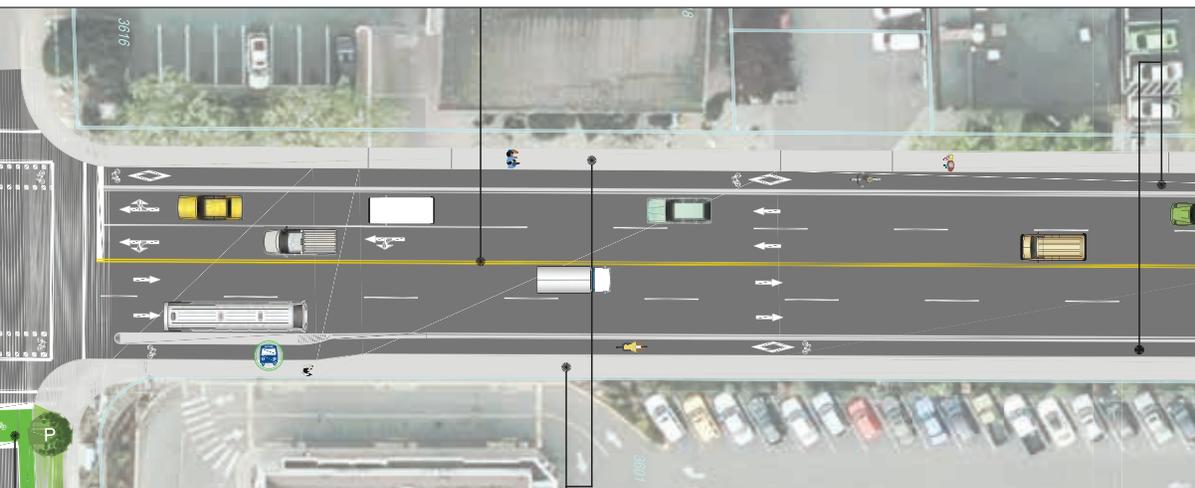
| Shelbourne Street Concept Example, Pear Street to Christmas Avenue
